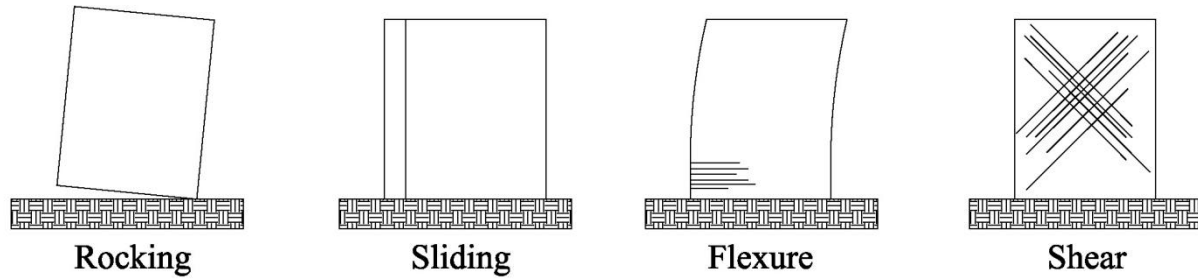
Masonry Shear Wall Failure Modes (adapted from Eikanas, 2003)
